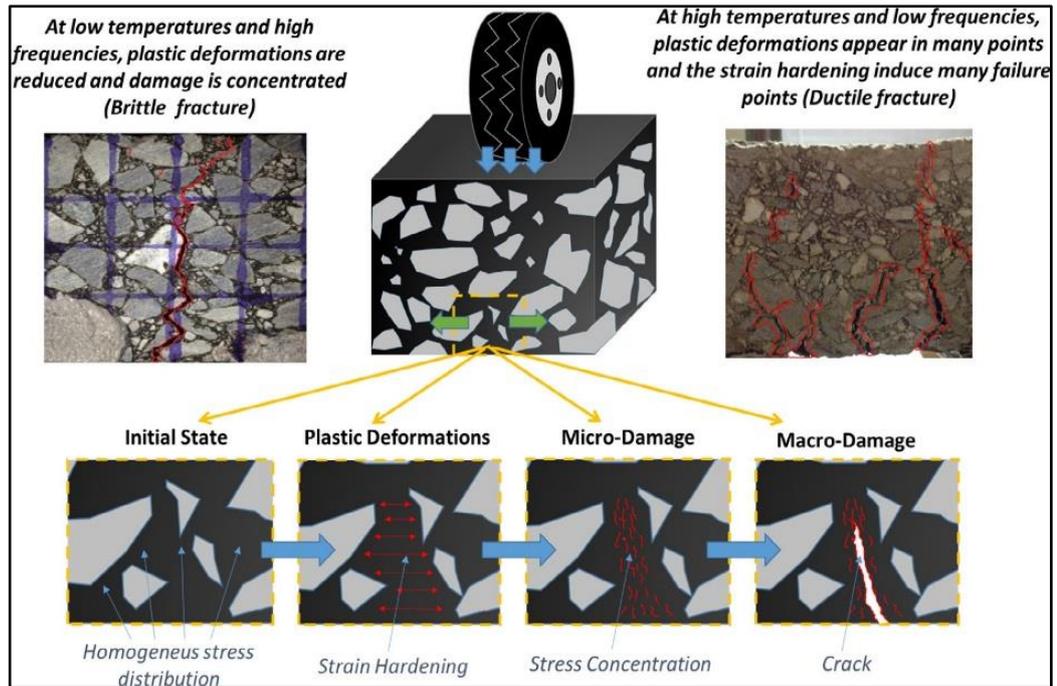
Stresses transmitted by wheel loads over asphalt structures (Moreno-Navarro & Rubio-Gómez, 2016)
